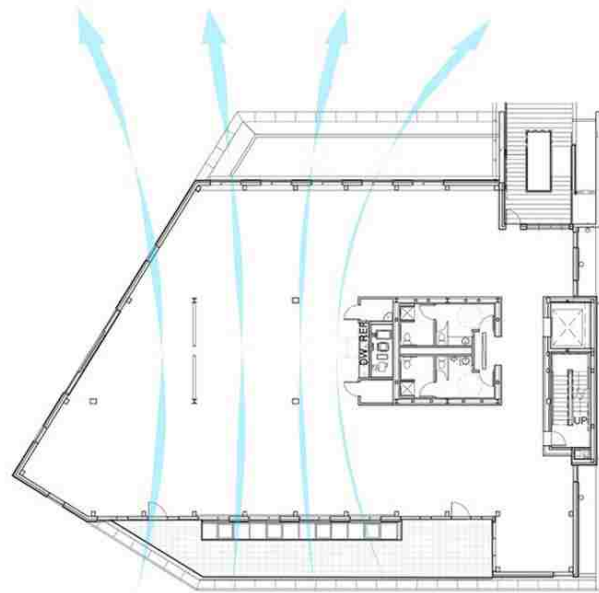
Floor plan of the Bullitt Center showing cross-ventilation efficiency
